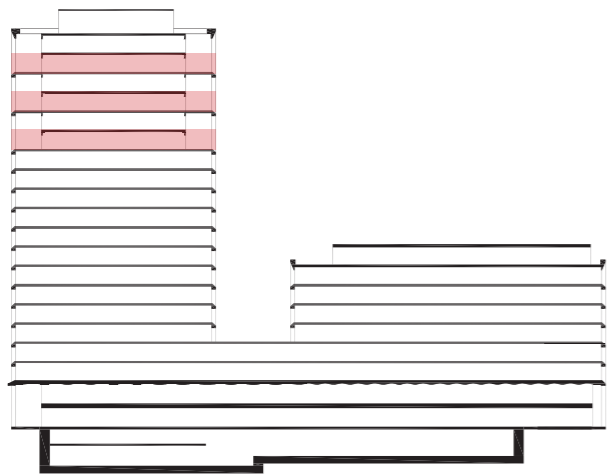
Fourteenth, sixteenth and eighteenth floor plan
